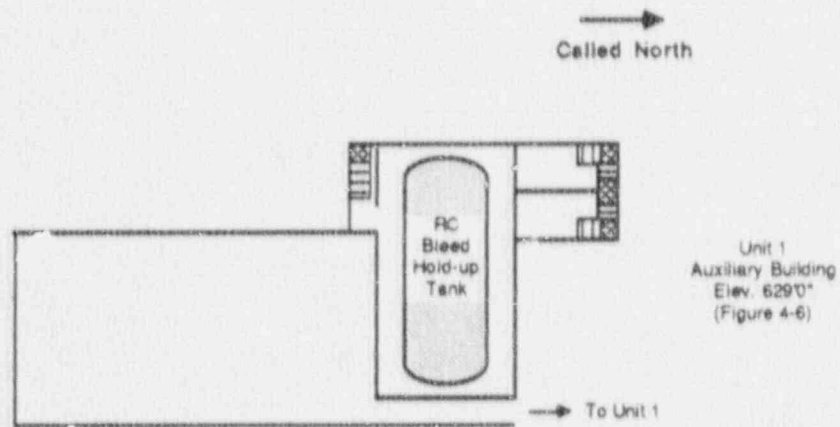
Bellefonte 2 Auxiliary Building, Elevation 579'-0"
